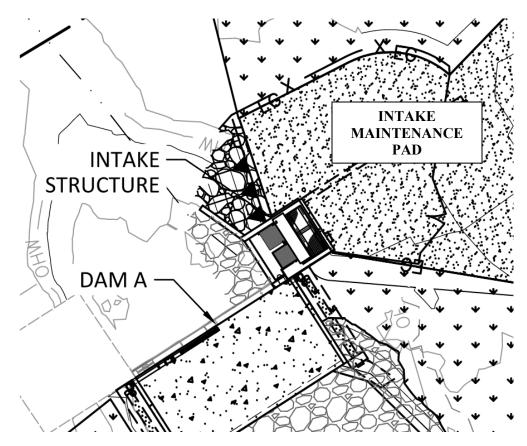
FCFH Intake Structure and Dam A Plan View.
